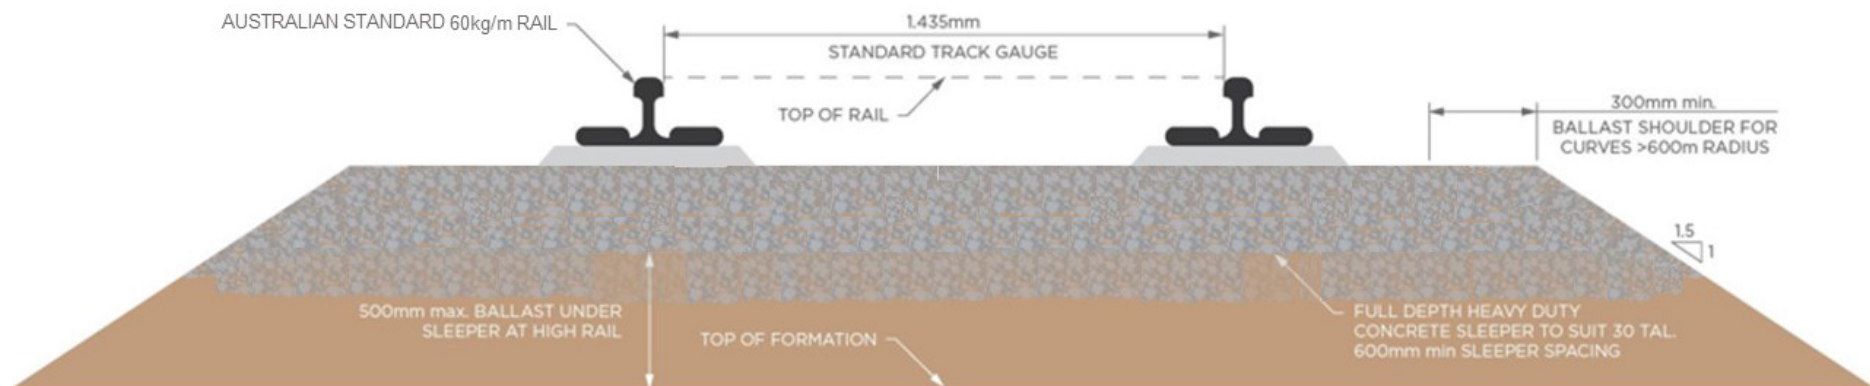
TYPICAL STANDARD-GAUGE BALLASTED TRACK CROSS SECTION
